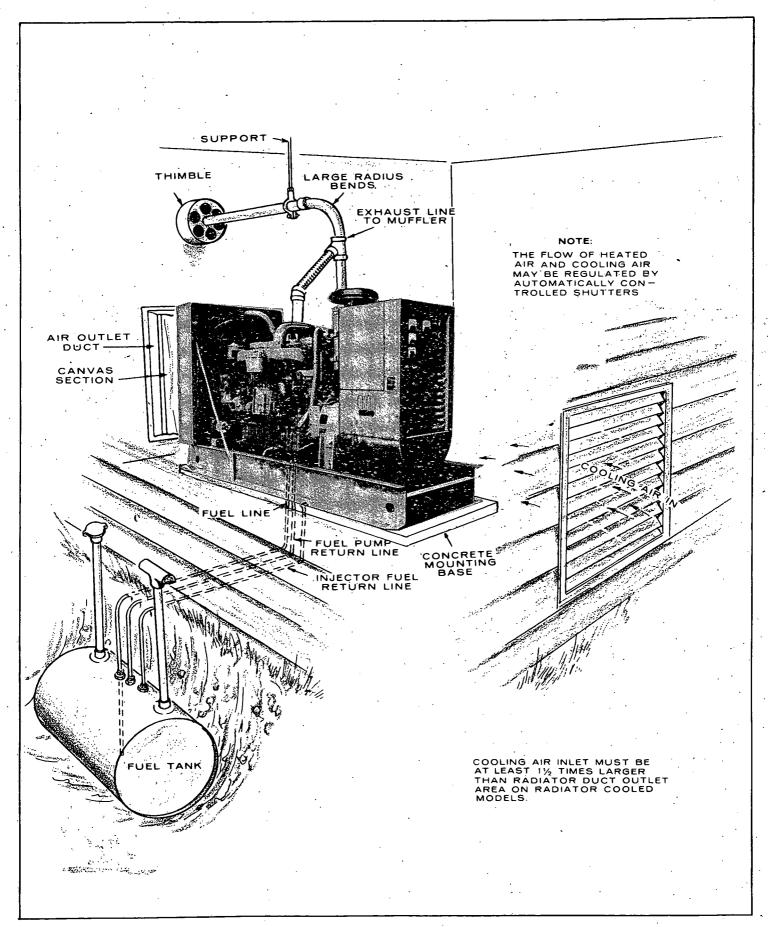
A TYPICAL STANDBY INSTALLATION
